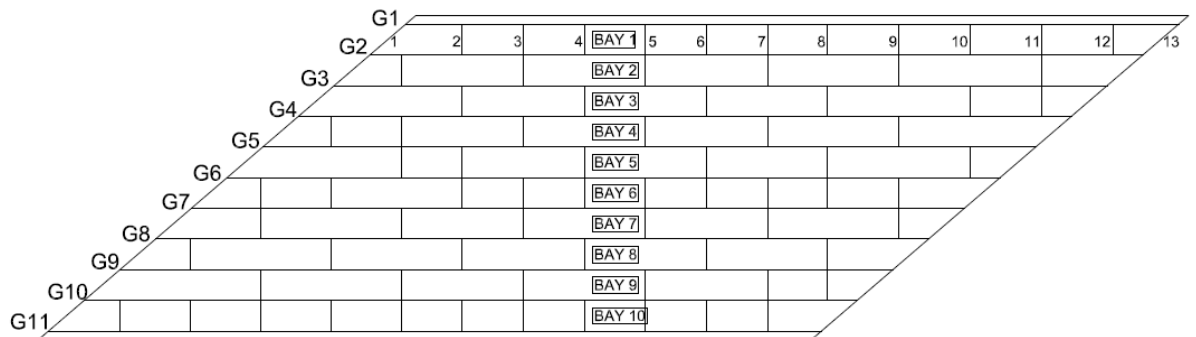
Girder, bay, and cross-frame numbering for Bridge 2.
